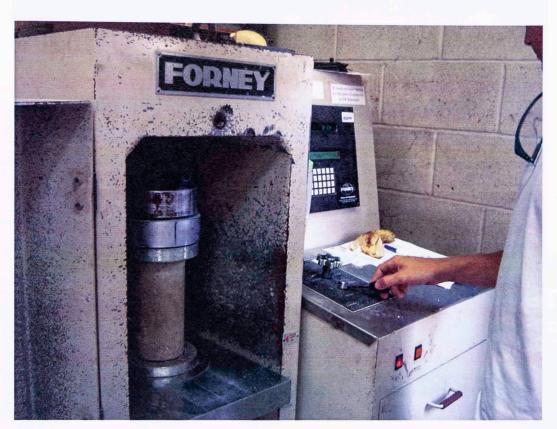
Loading a Specimen Using the Forney LC-1 Testing Machine
